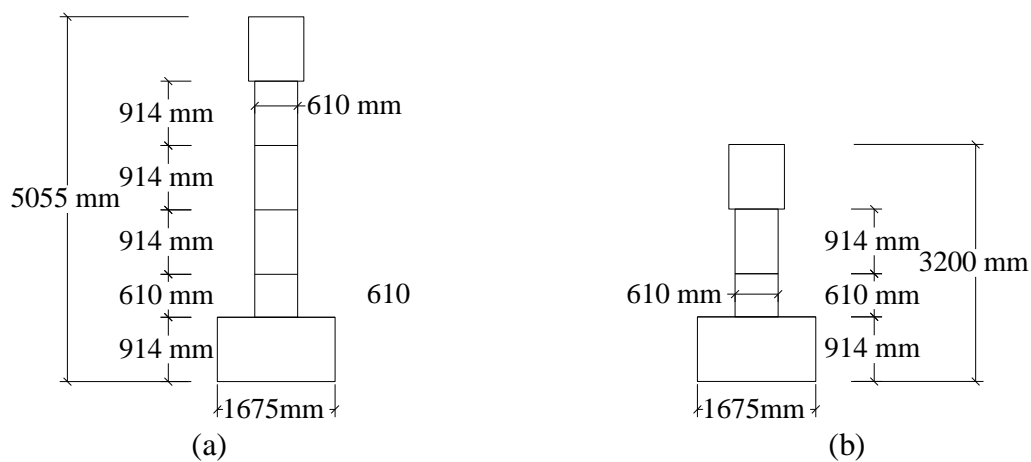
Detailed dimensions for (a) standard pier and (b) pier B
